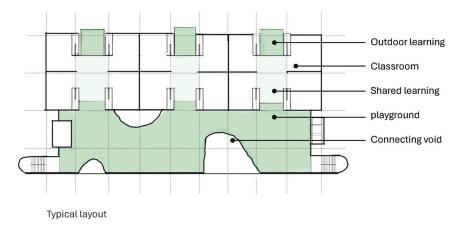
Urban school plan layout diagram. (Source: author, 2022).
